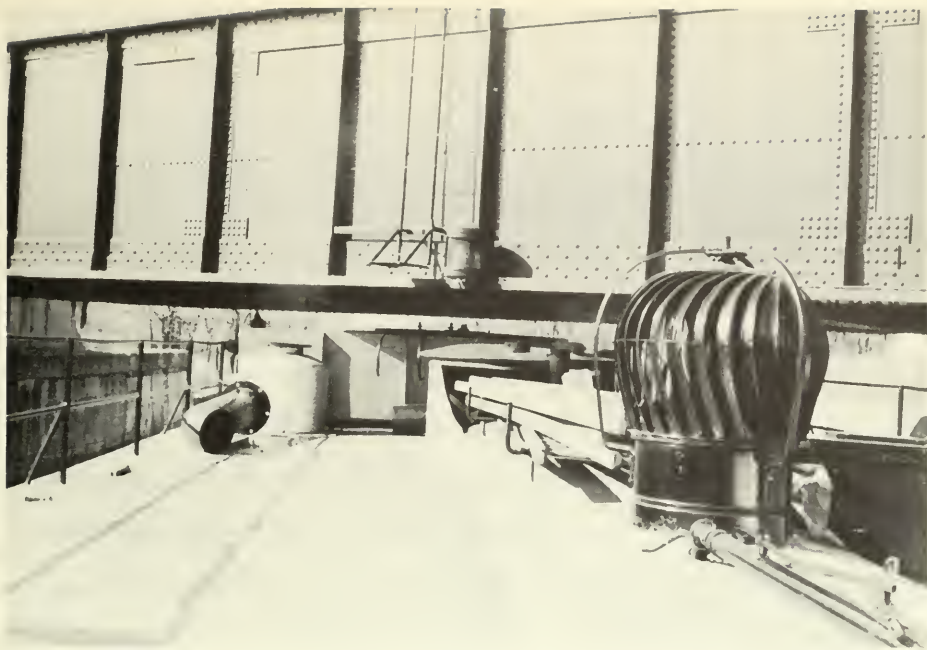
Towboat passing under the Sag Channel Rock Island Railroad bridge with less than three inches of clearance. Notice retracted pilot house, detached exhaust pipes and mast.
